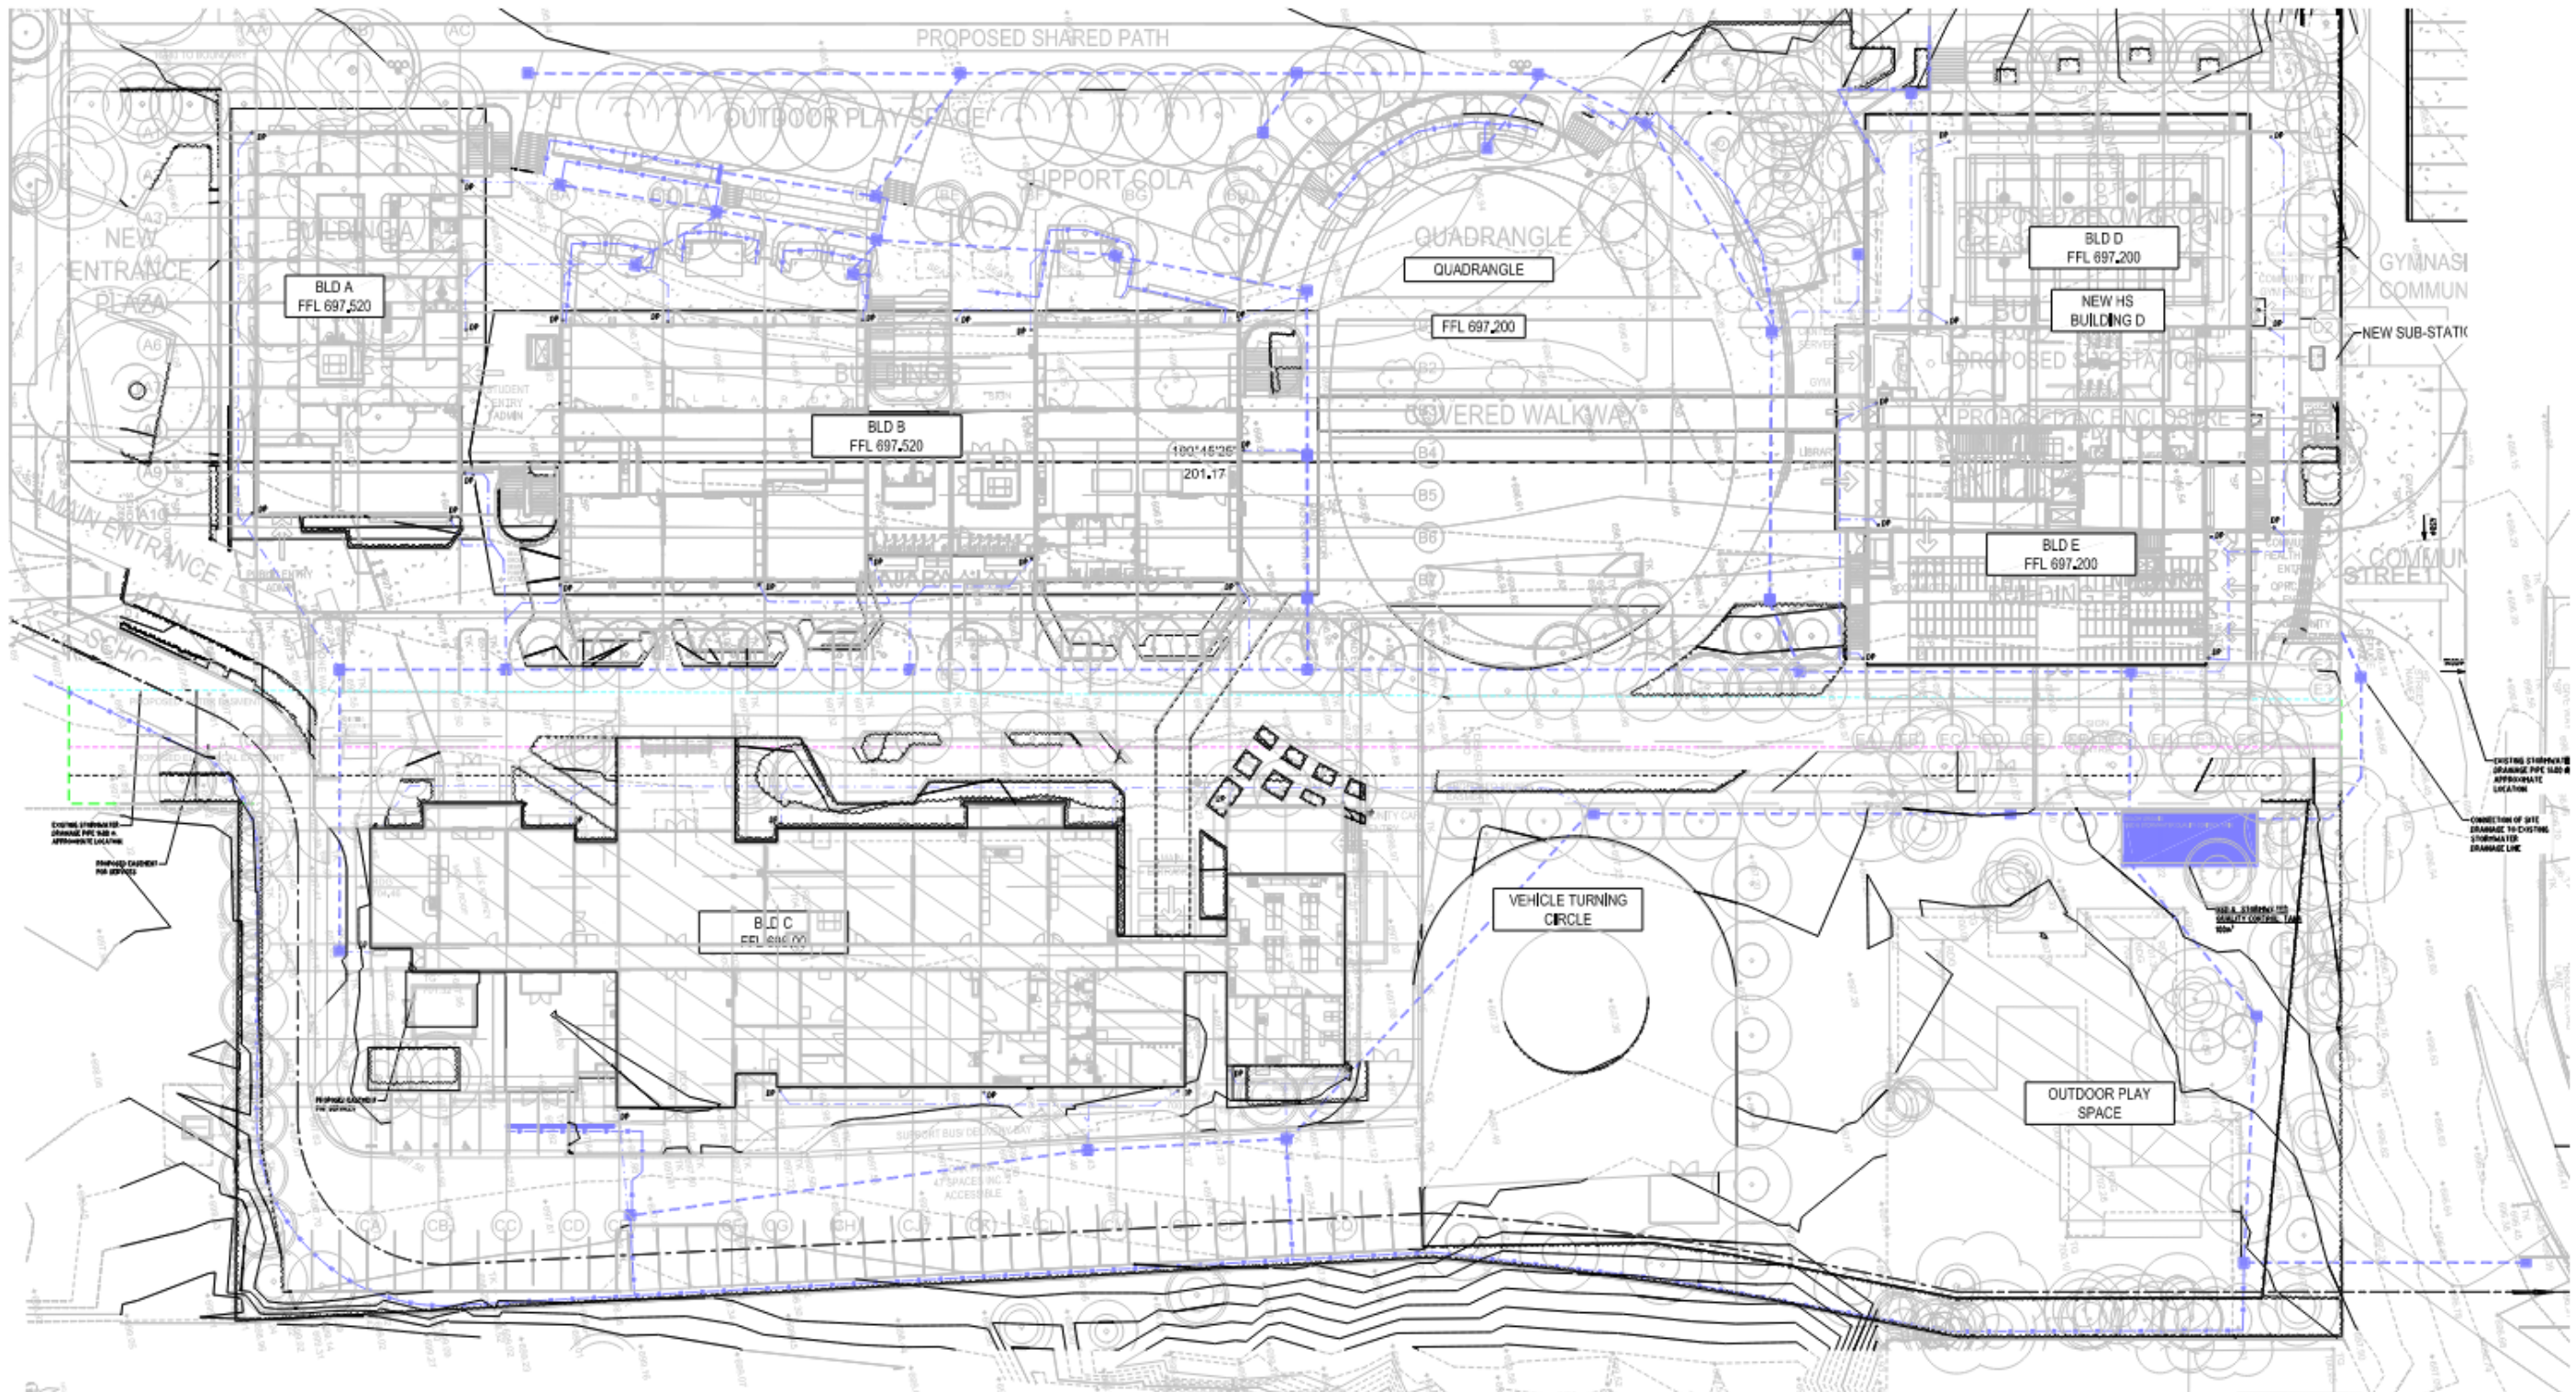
High School Site Stormwater Drainage Plan - REFER APPENDIX B FOR FULL DRAWING(S)
